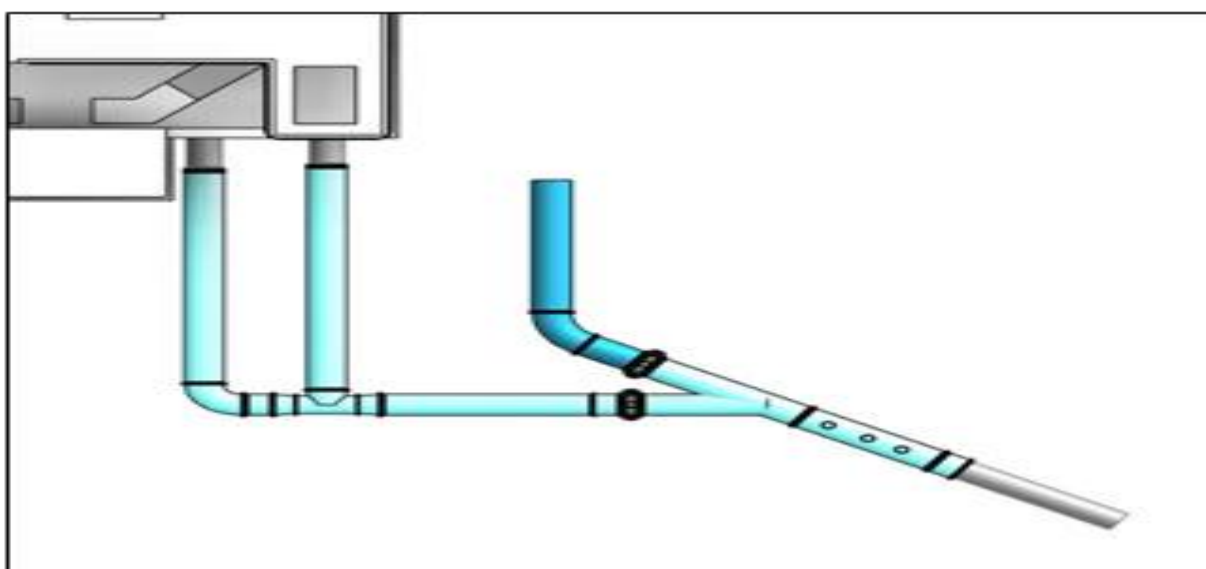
CURRENT OUTFALL ARRANGEMENT WITH AGS CONNECTION
